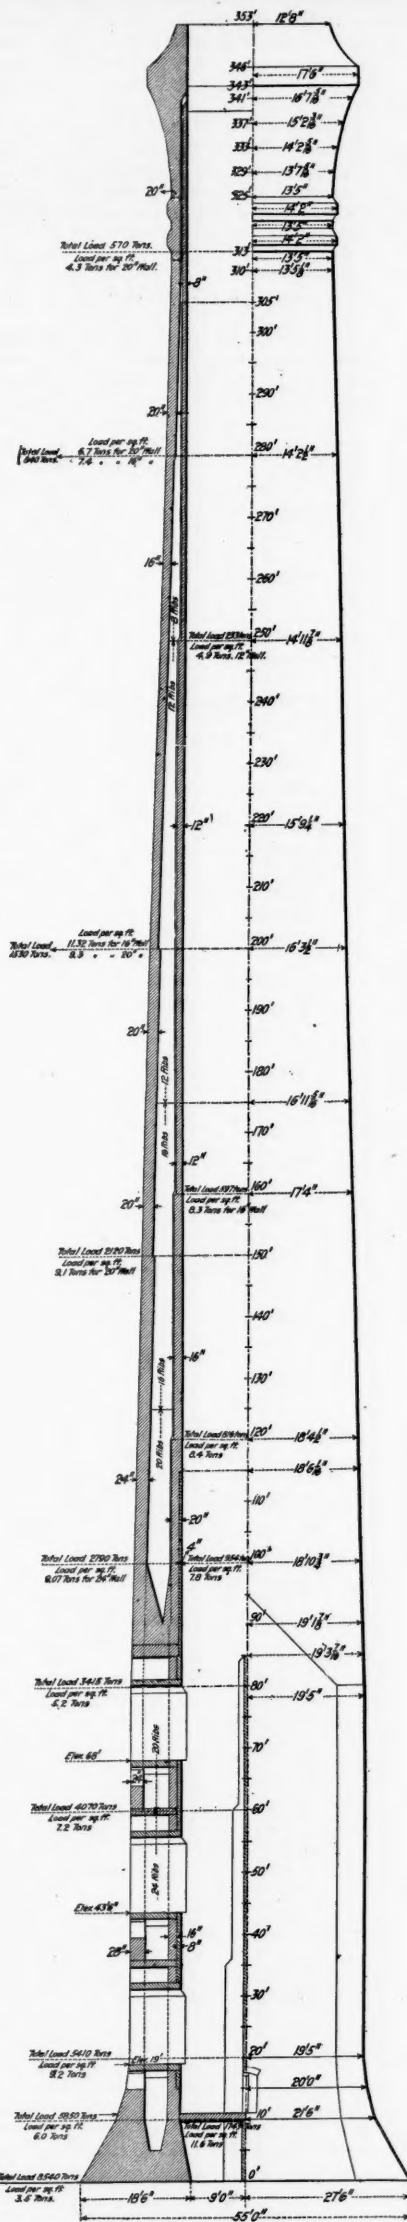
Chimney of the Metropolitan Street Ry. Power House, 96th street, New York.
